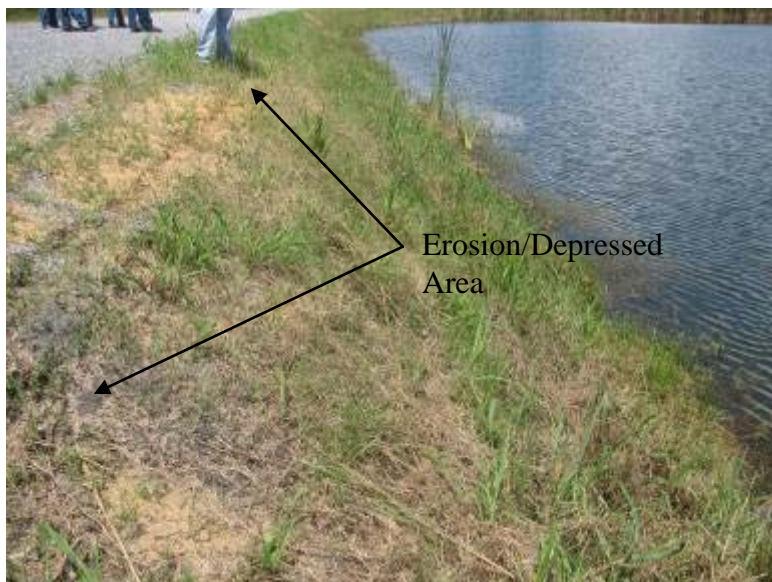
Upper West Pond – West embankment interior slope, showing erosion/depressed area approximately 30-foot long, looking north.
